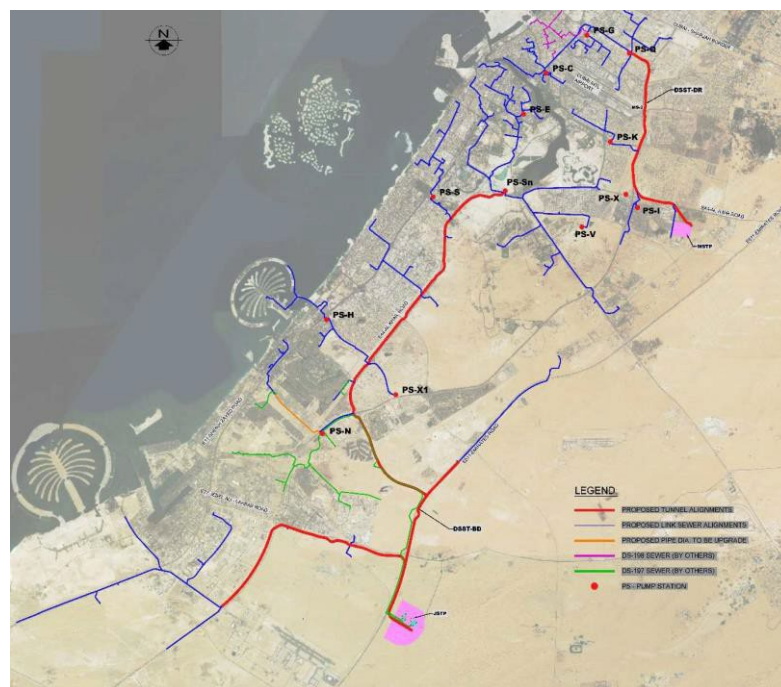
Key plan of project area of Dubai Strategic Sewerage Tunnel. (Dubai Municipality DS 215, 2016)
